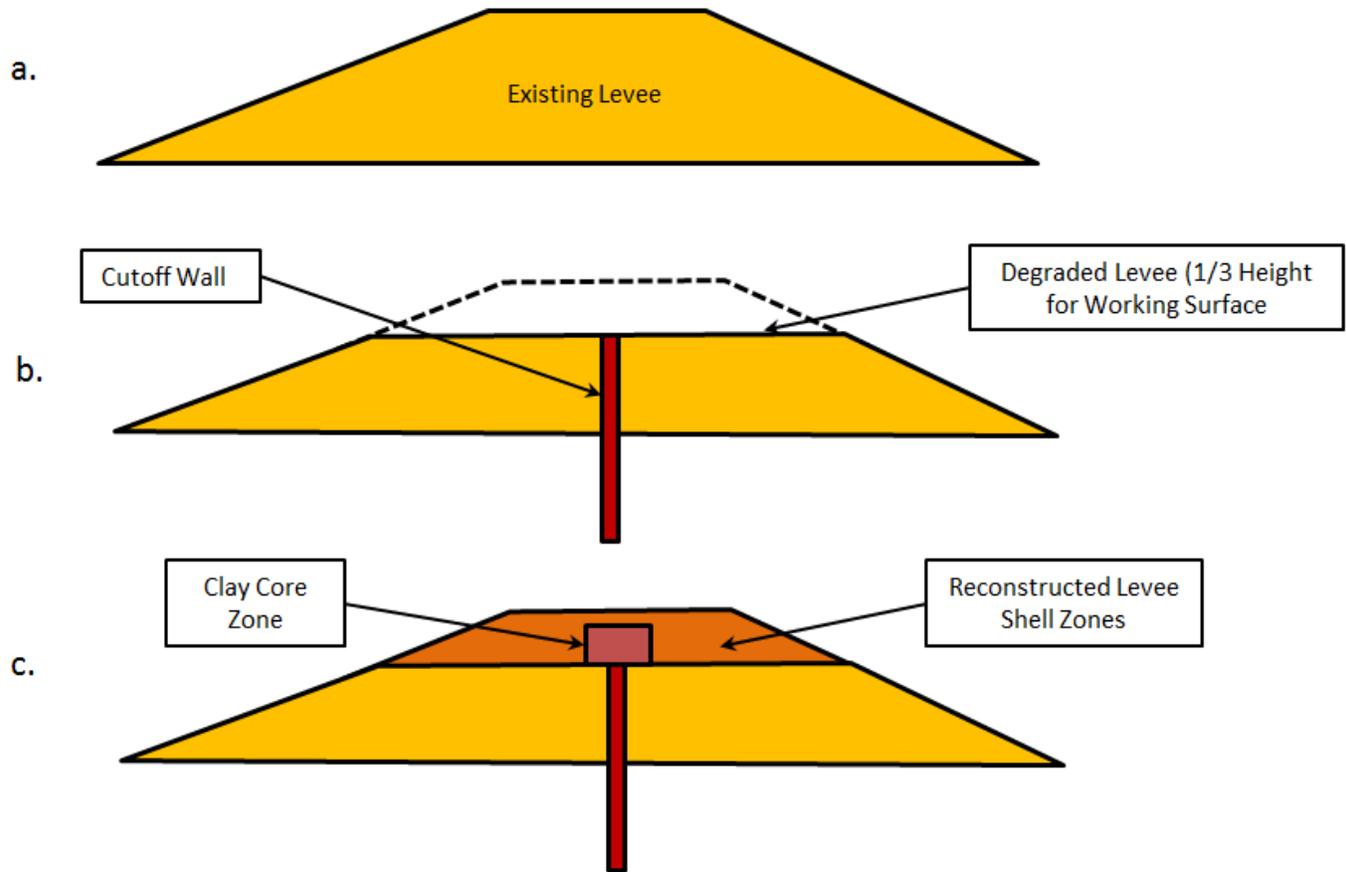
Schematic Sequence of Cutoff Wall Construction and Levee Reconstruction
